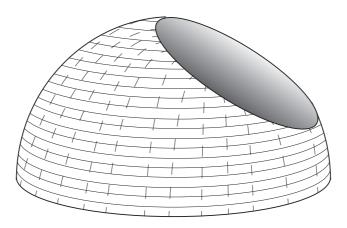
Illustration showing placement of reinforcement where dashed vertical lines correspond to reinforcement according to moment and the horizontal lines reinforcement due to tension stresses.
